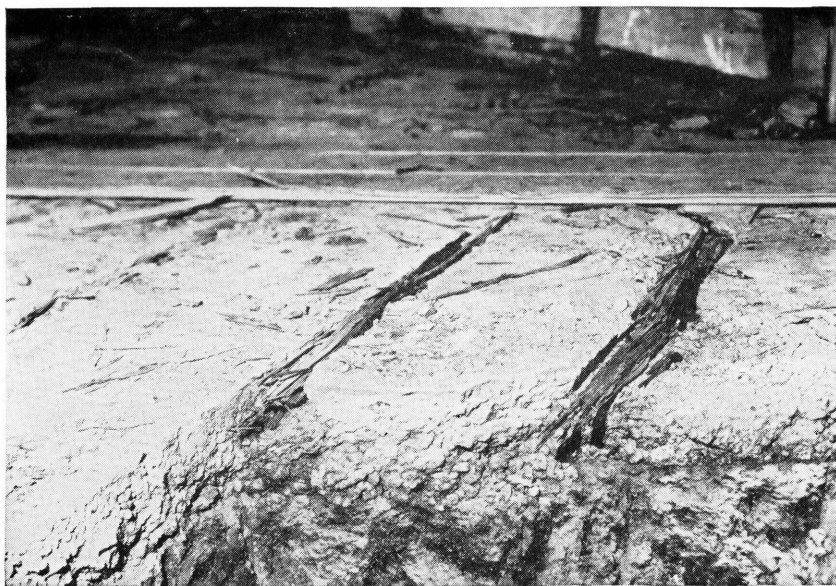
Damage to untreated sleepers embedded in concrete flooring.
